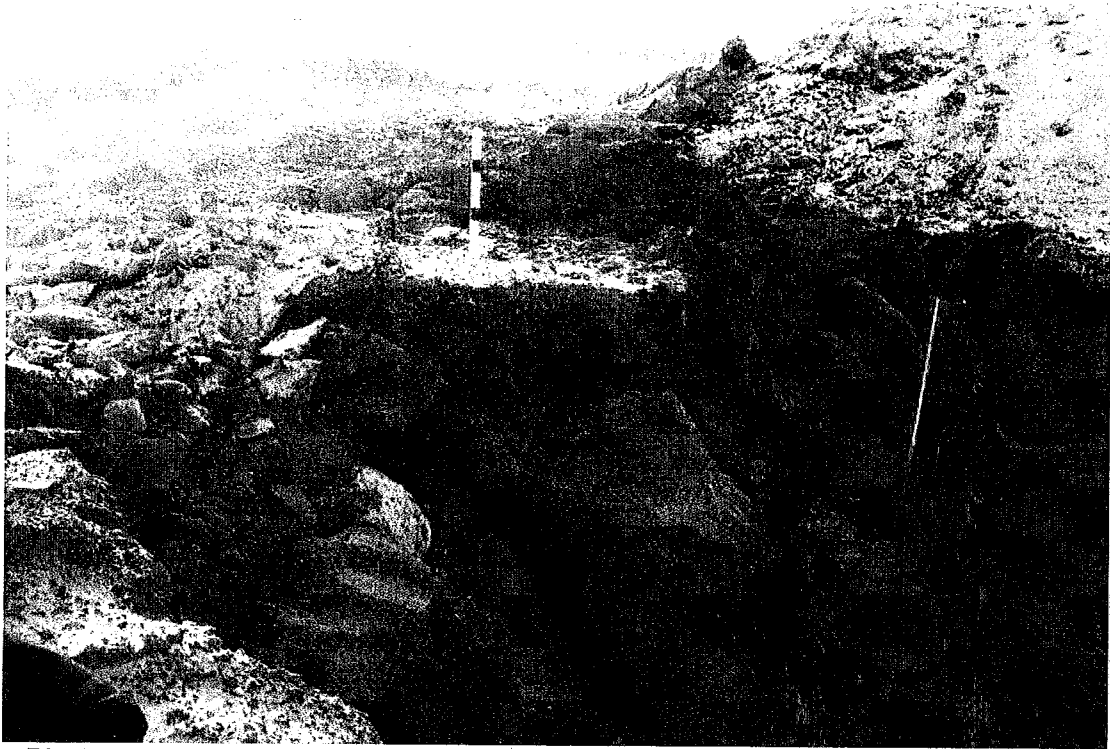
"tube-a-manchette" (TAM) grouting tube (white) in test zone still to be excavated
